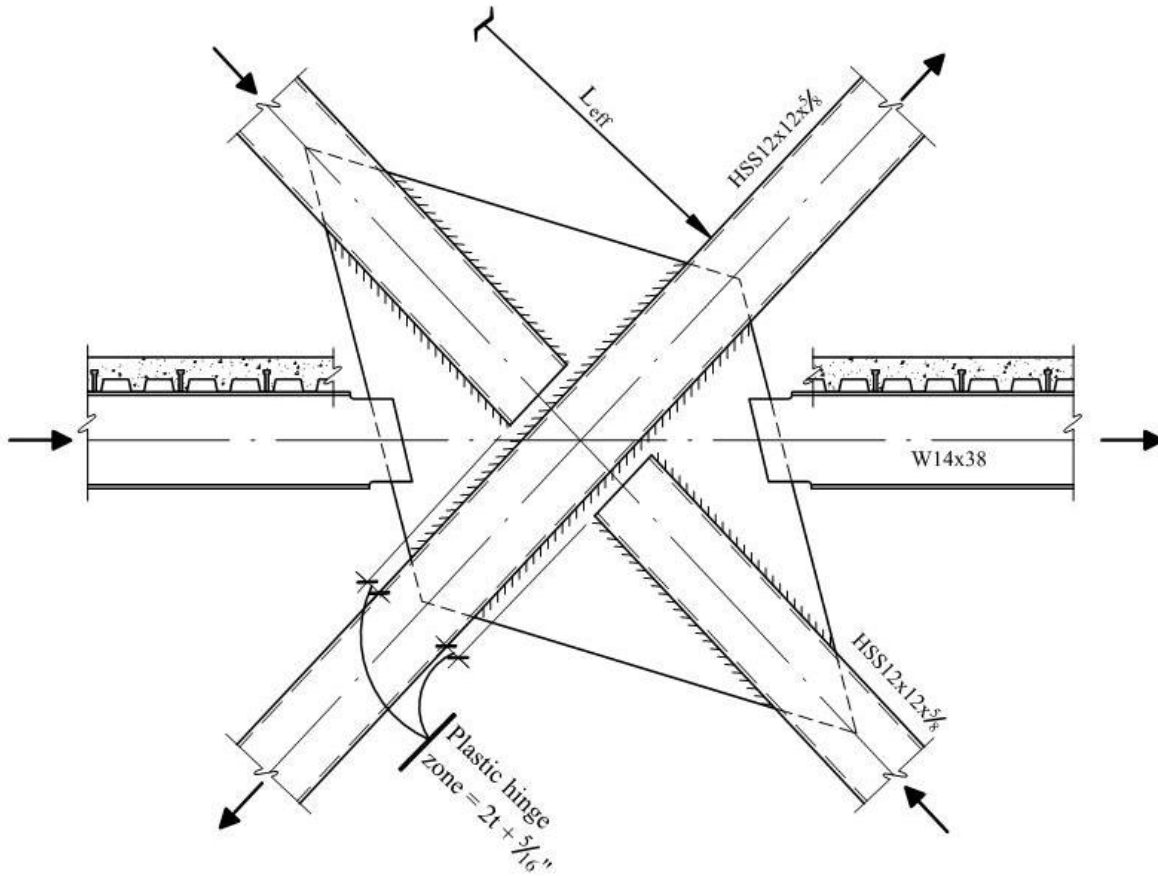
Brace-to-brace connection (1.0 in. = 25.4 mm).
